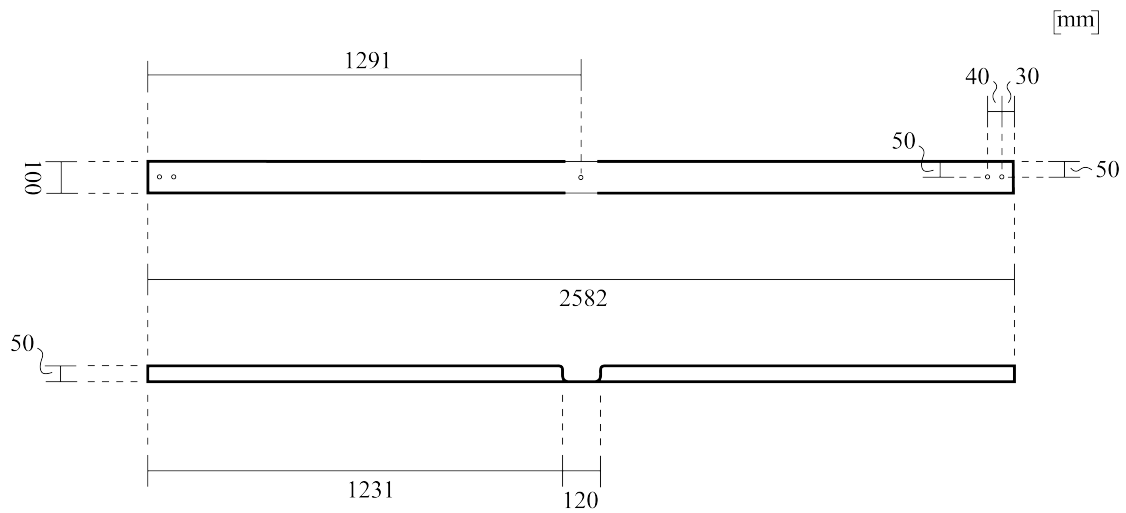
Drawing of an inner diagonal in a module with measurements assuming that M16 bolts are used.
